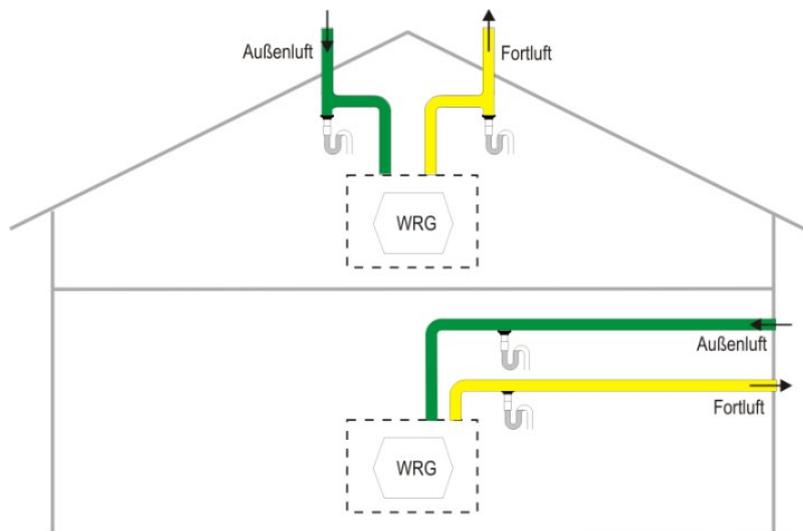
Drainage arrangement for outdoor and exhaust air tubes
